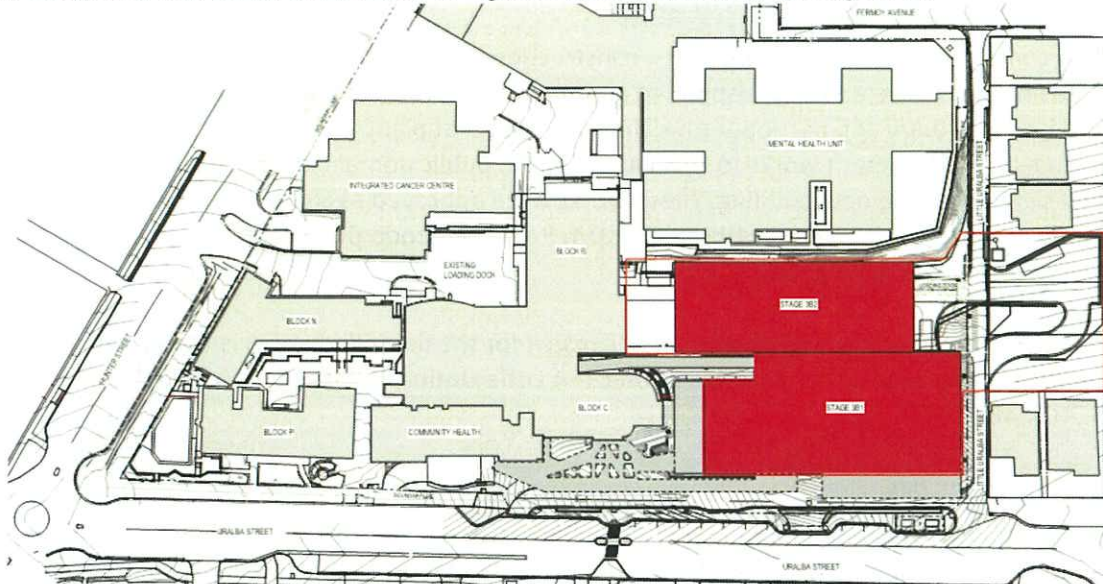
Site Plan showing the specific location of the north tower. (Woods Bagot Drawing No. DA1000)
